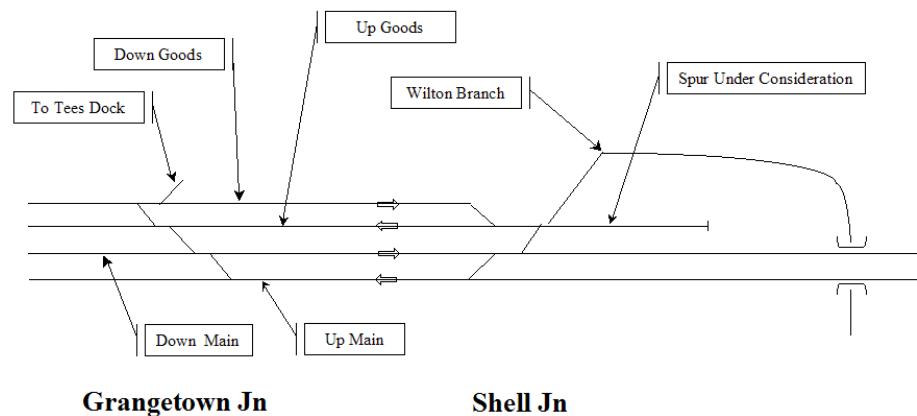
Schematic track layout showing the Grangetown Junction and Shell Junction
